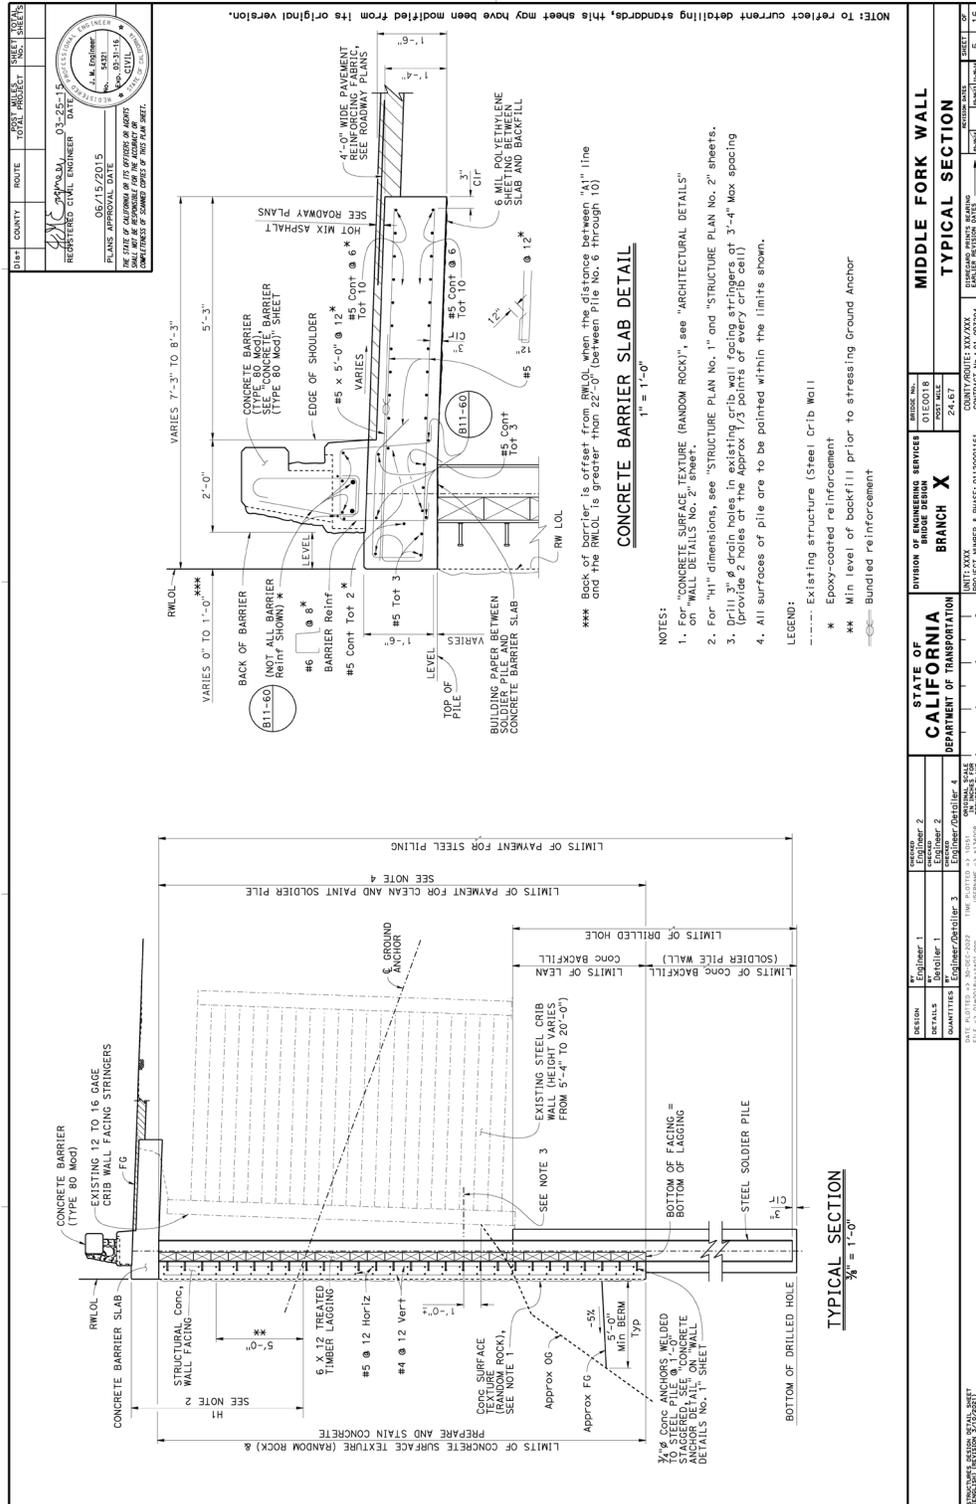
A.B.4 Soldier Pile Retaining Wall Detailing Example 4
